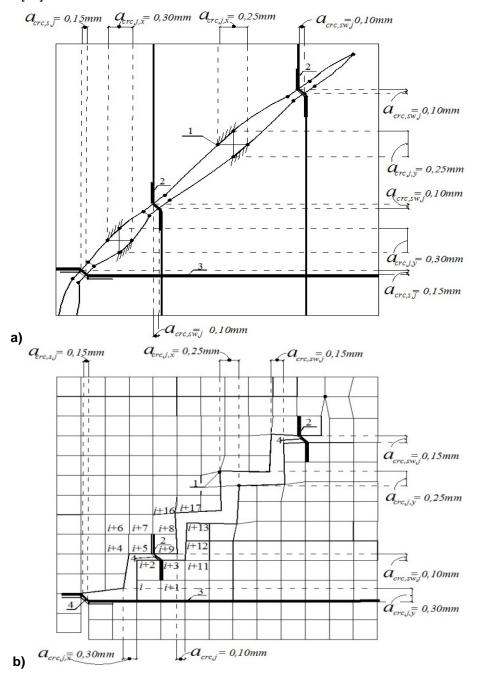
The calculation model of the aboveground and underground parts of the building under seismic action (a) and the scheme of basic and adjacent discrete cracks in RC wall panels (b)
